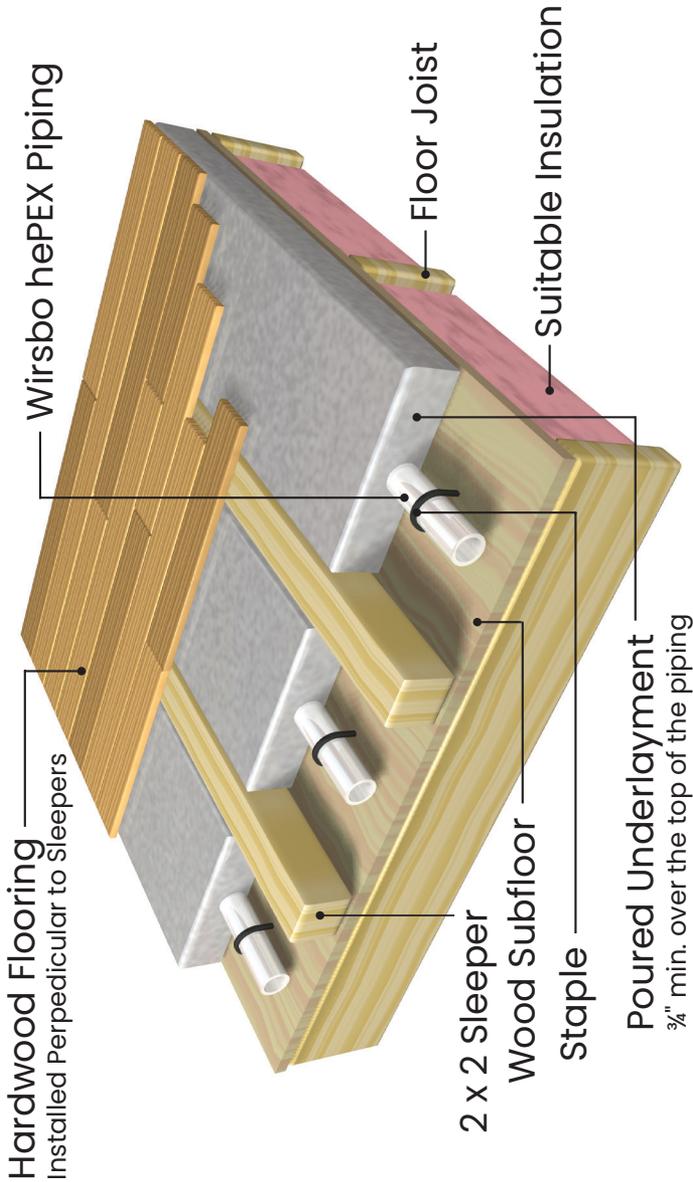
Poured underlayment with sleepers over a suspended wood subfloor
